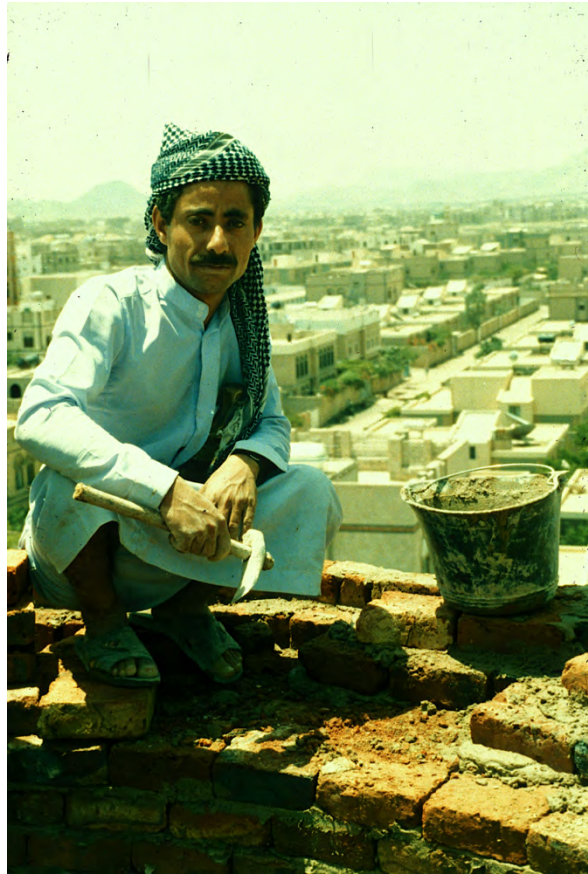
Minaret building in Sanaa, Yemen. A mason laying bricks at the top of the tower. Photograph by T. Marchand.
